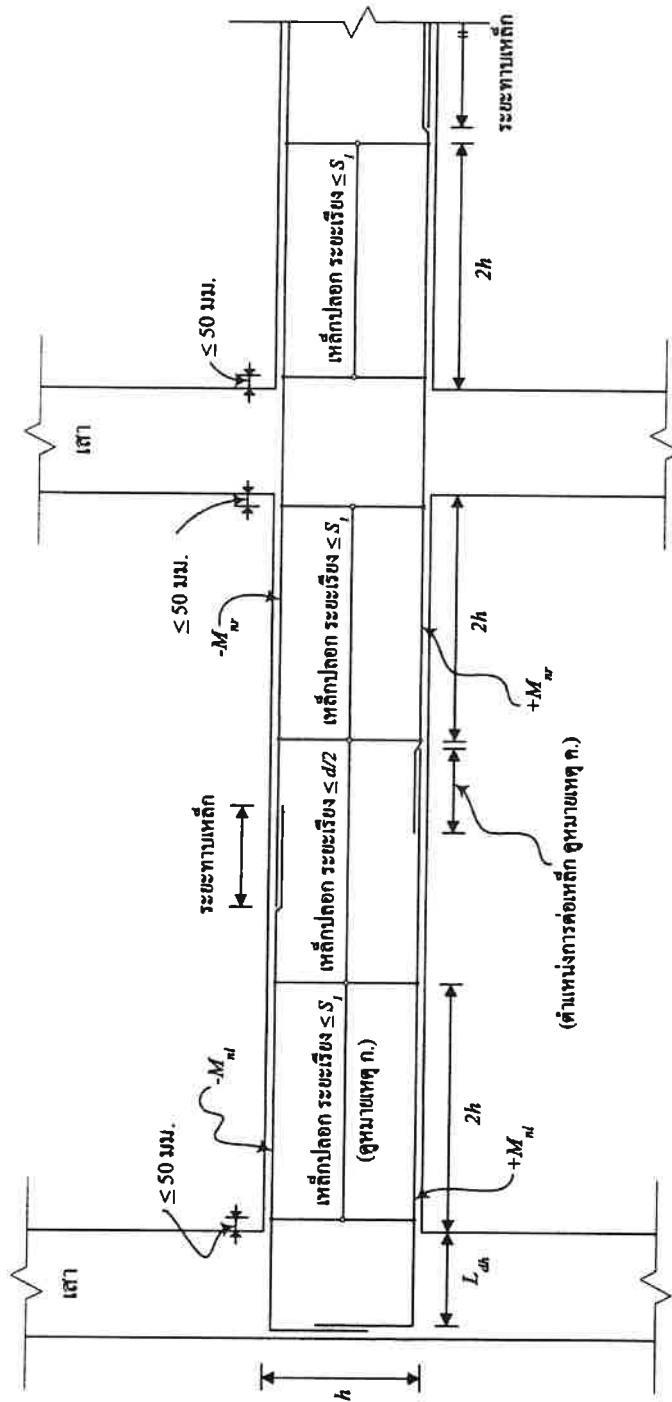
Non-Ductile Rebar (Not to Used in Design)
